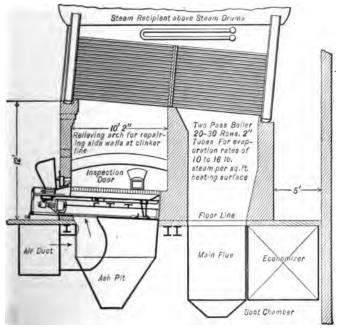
SECTION OF WATER-TUBE BOILER WITH HIGH SETTING.
